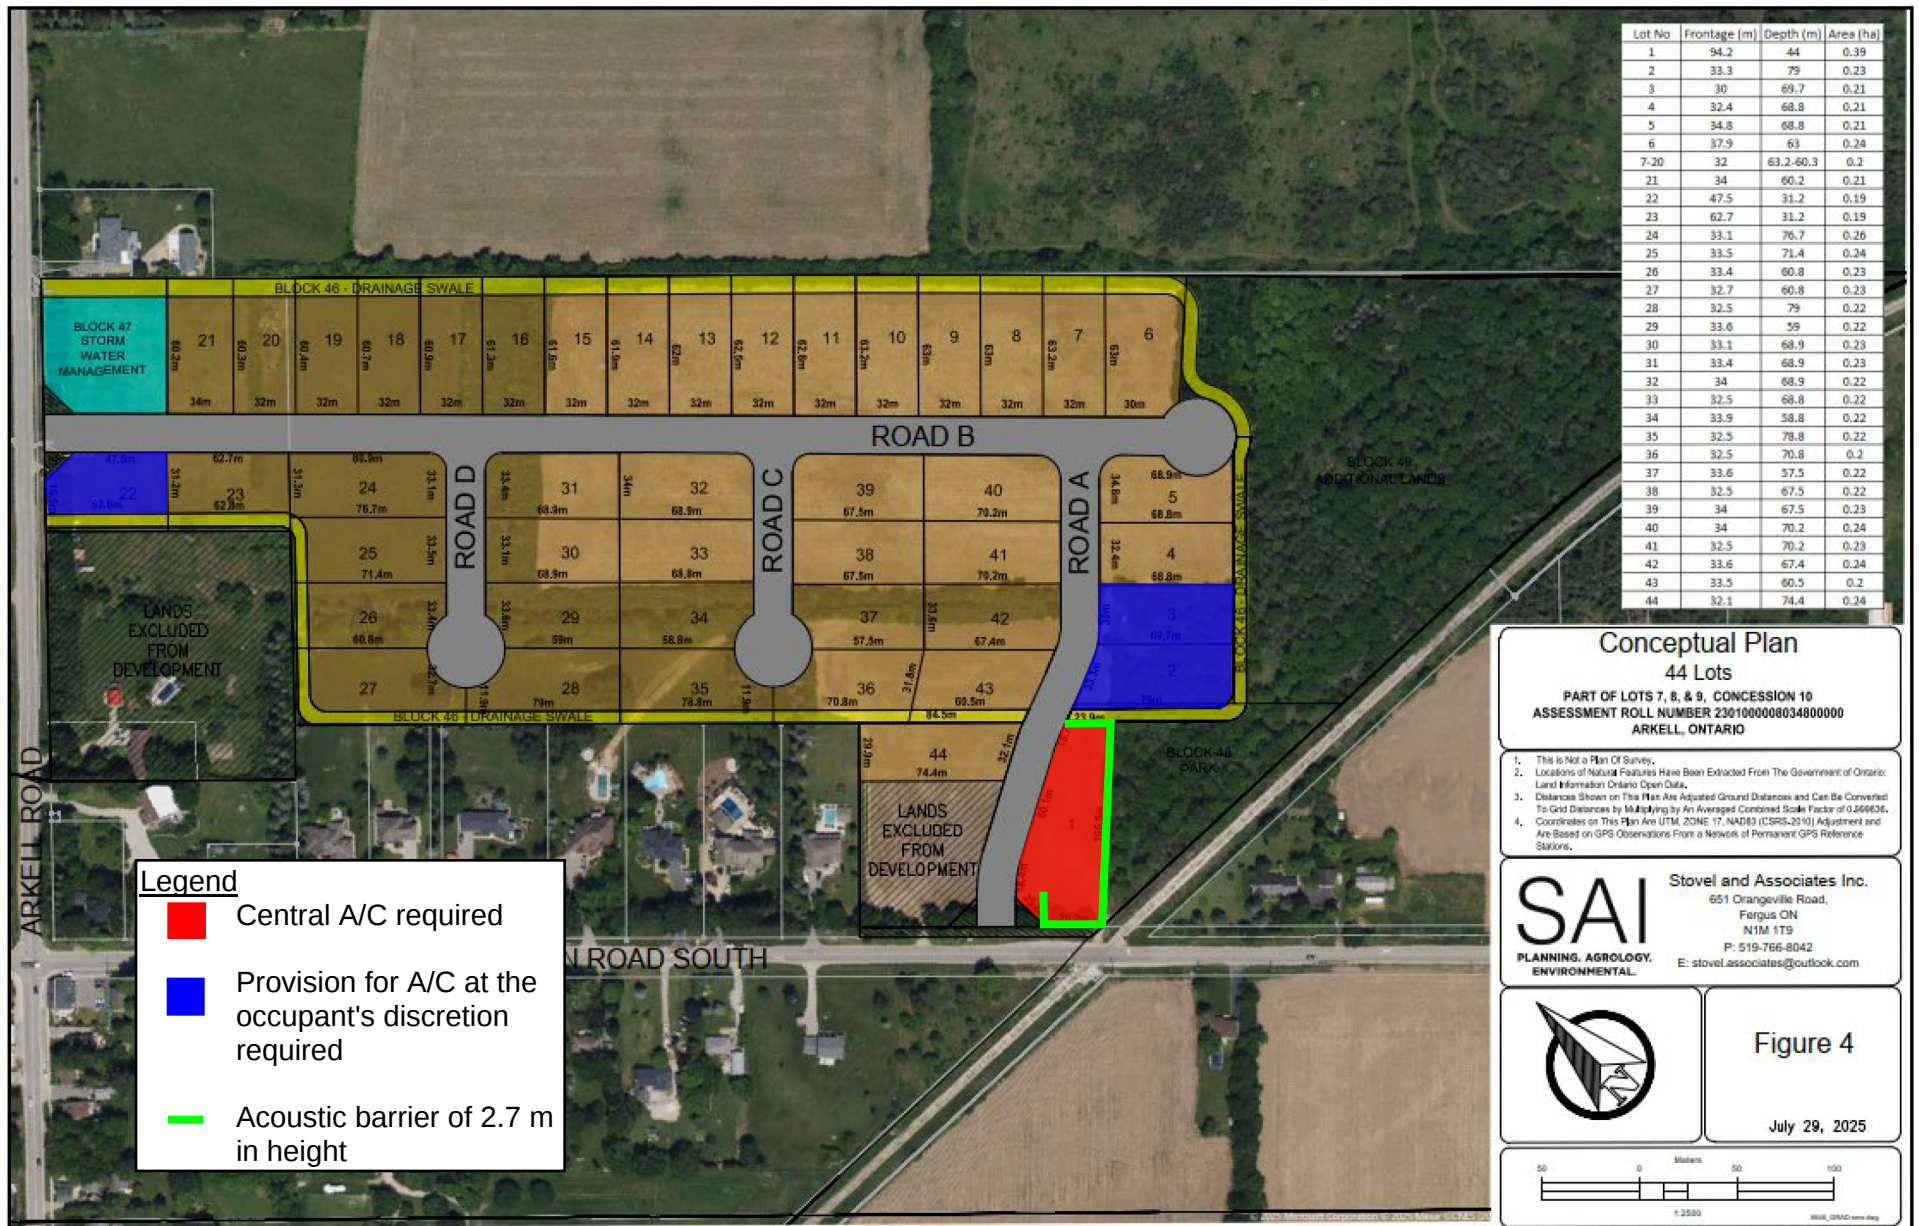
Proposed Concept Plan Showing Ventilation and Acoustic Barrier Requirements
